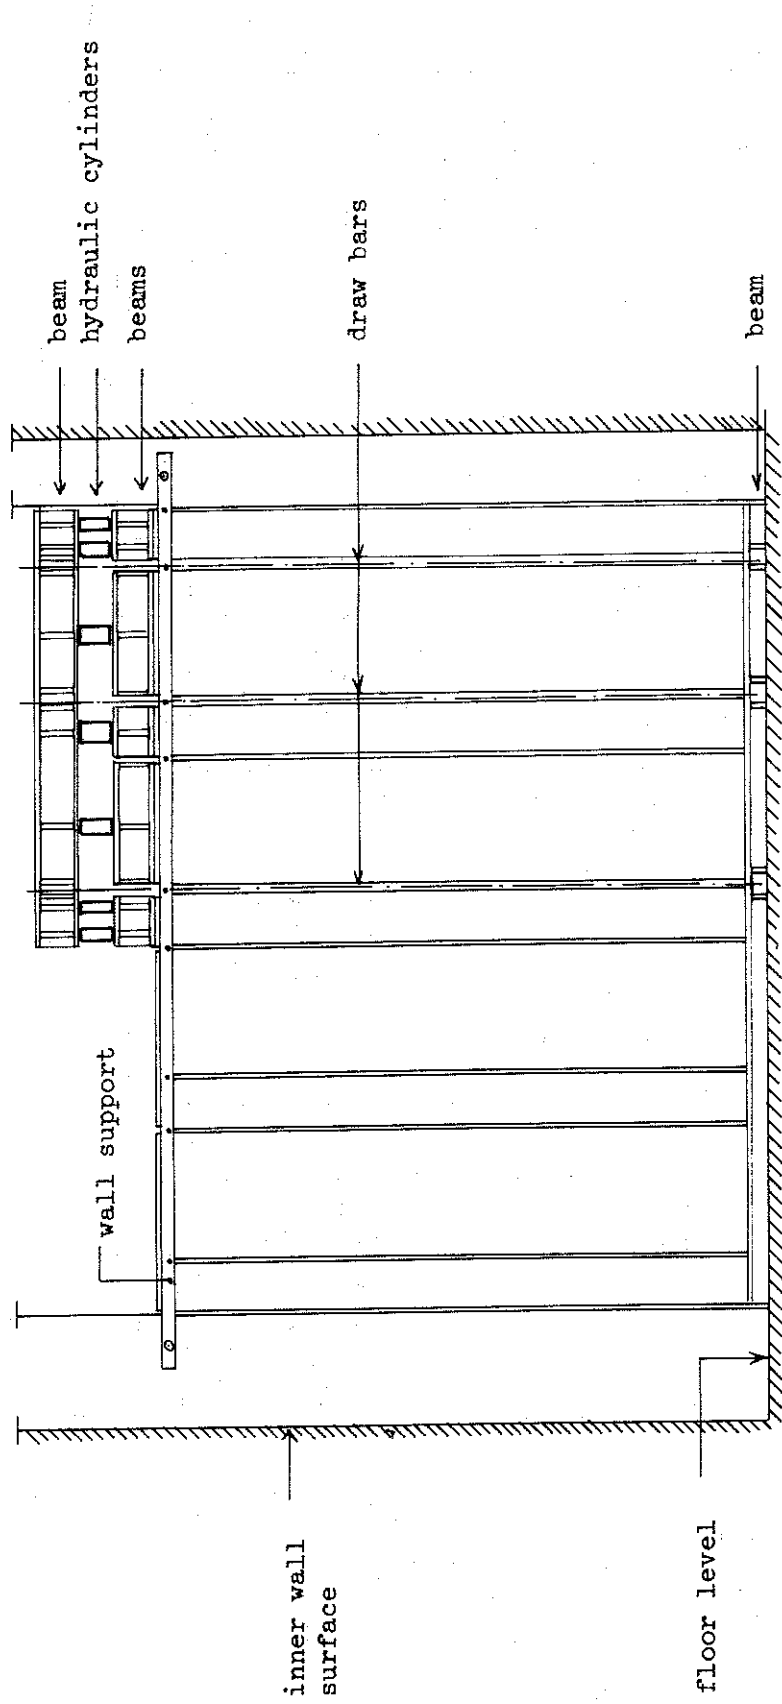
Test house II, inside south wall with hydraulic loading arrangements. Scale 1:30
